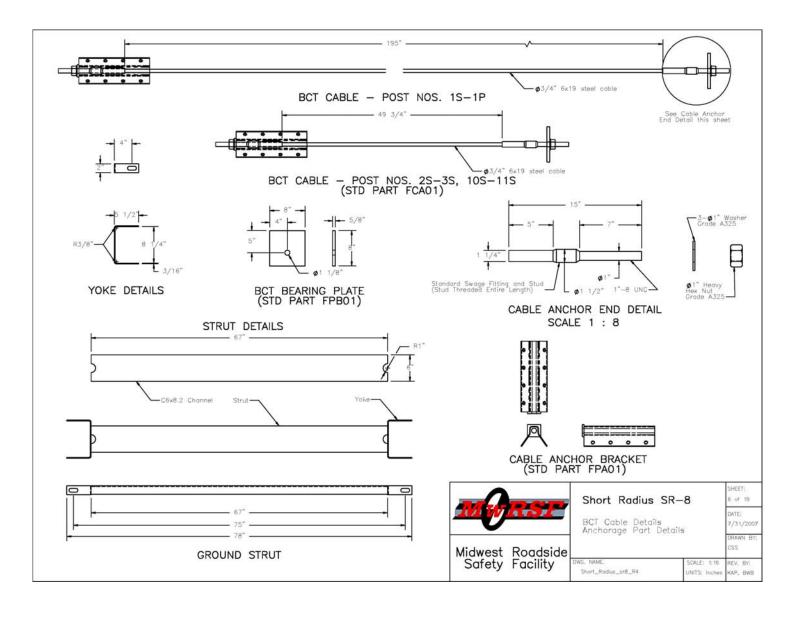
BCT Cable Detail and Anchorage Part Details (English)
